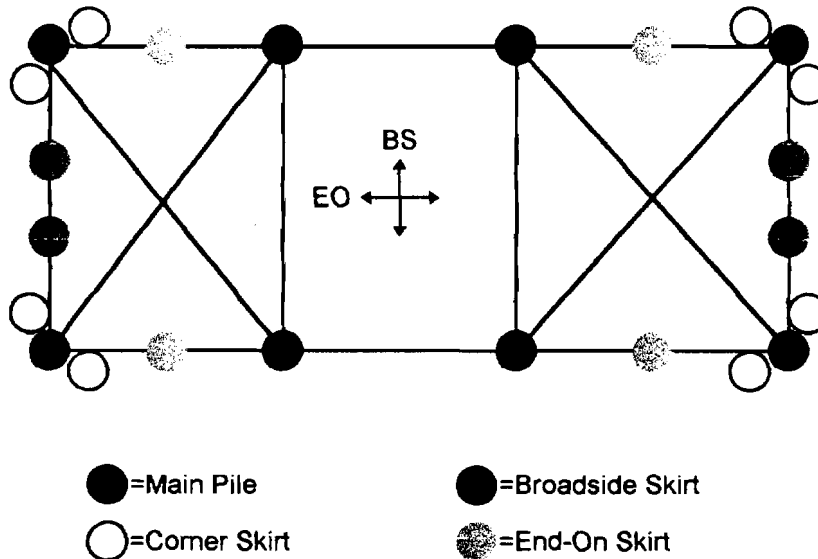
Plan View of Foundation with Skirt Pile Locations
